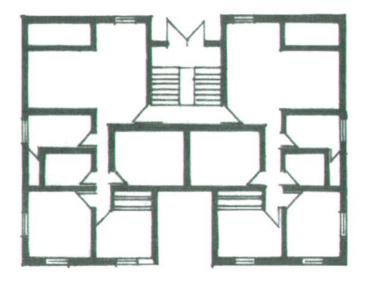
Typical Floor Plan of Apartment Type Complex, (Oktay, 2001)
